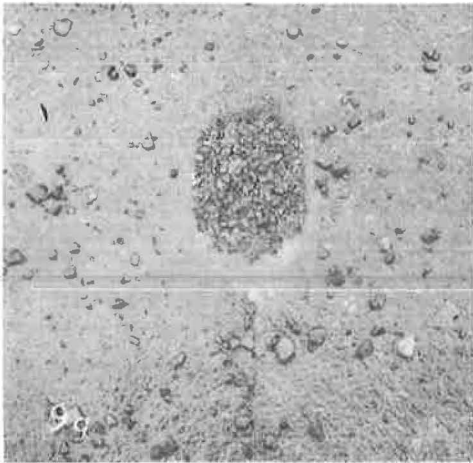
Test no. 13 (OK Rubber Co. "extra traction" tread without studs on new asphaltic-concrete shoulder): maximum depth of scour, 0.23 in.
